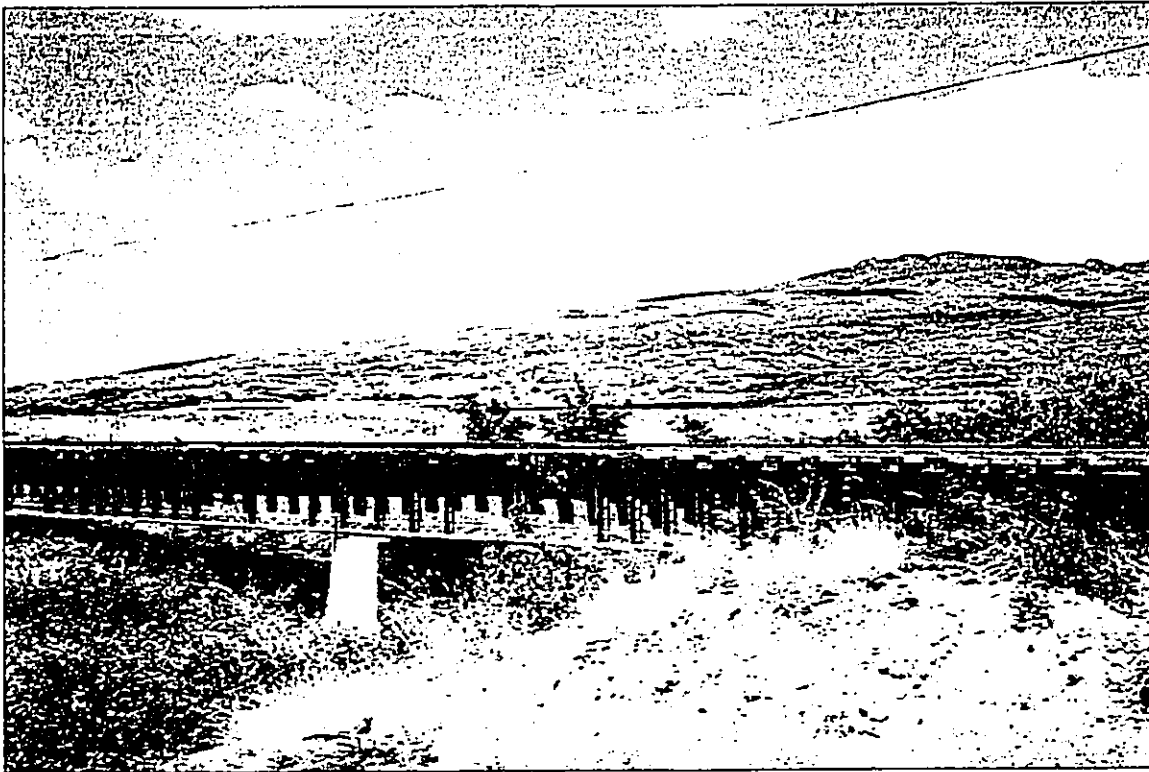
Mauka view of the proposed project area at an unnamed gulch crossing west of Kalaeloa Boulevard. Note the views of the Waianae Range and Makakilo.
